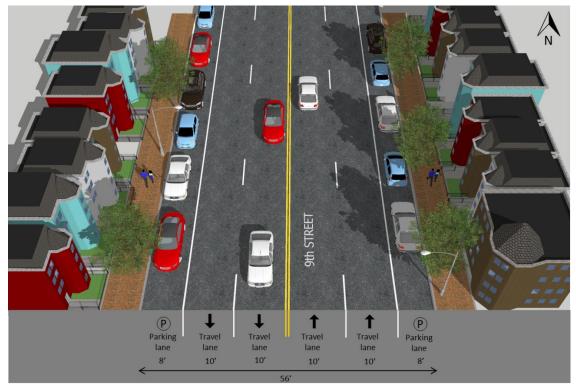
Alternative 0, 9th Street North of Massachusetts Ave
